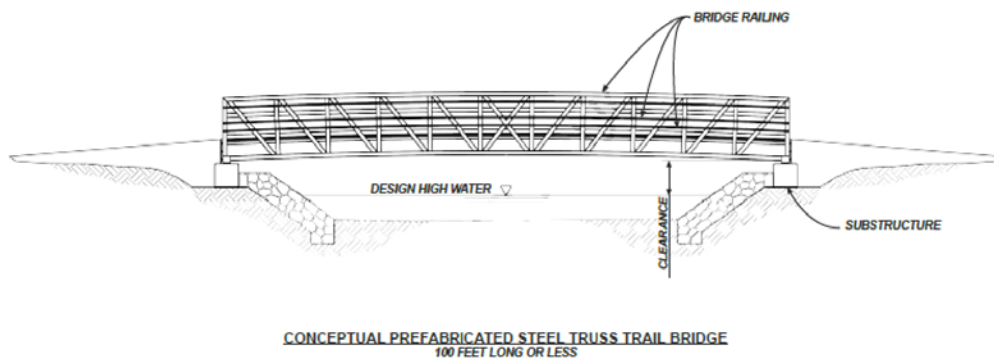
Concept Prefabricated Steel Truss Trail Bridge
